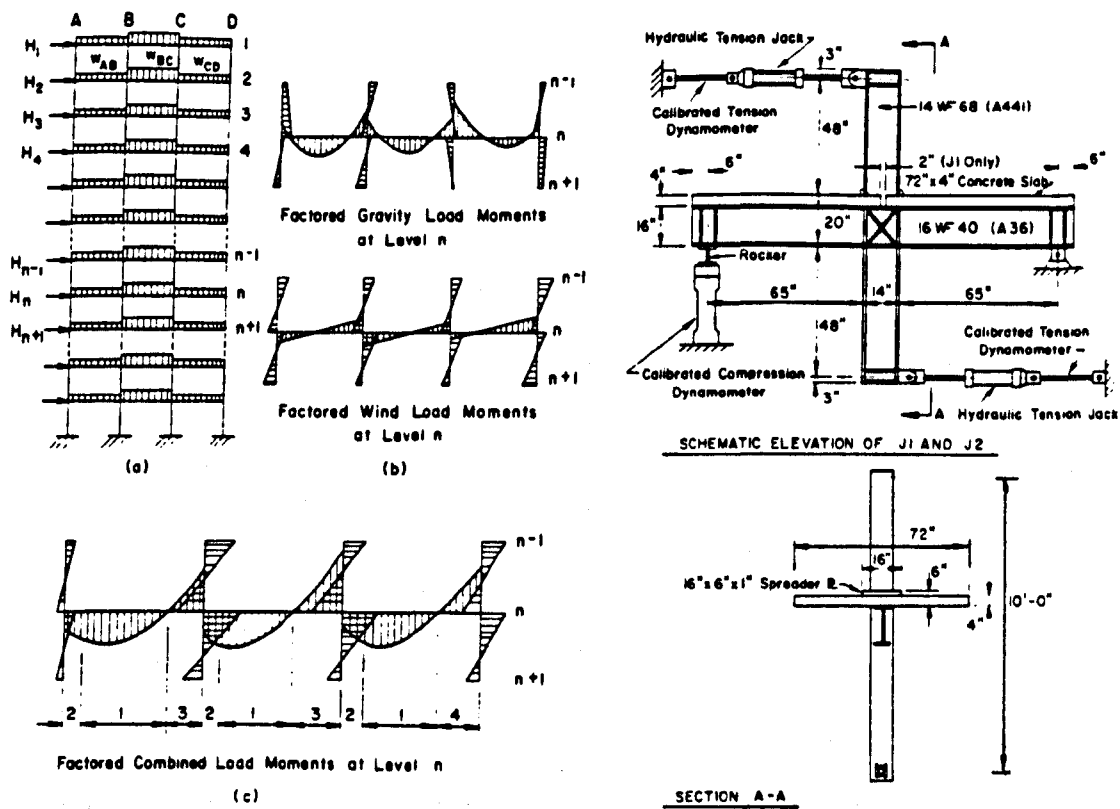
, Bending moments in unbraced multistory frames, and the schematic view of test specimens (Daniels et al)
